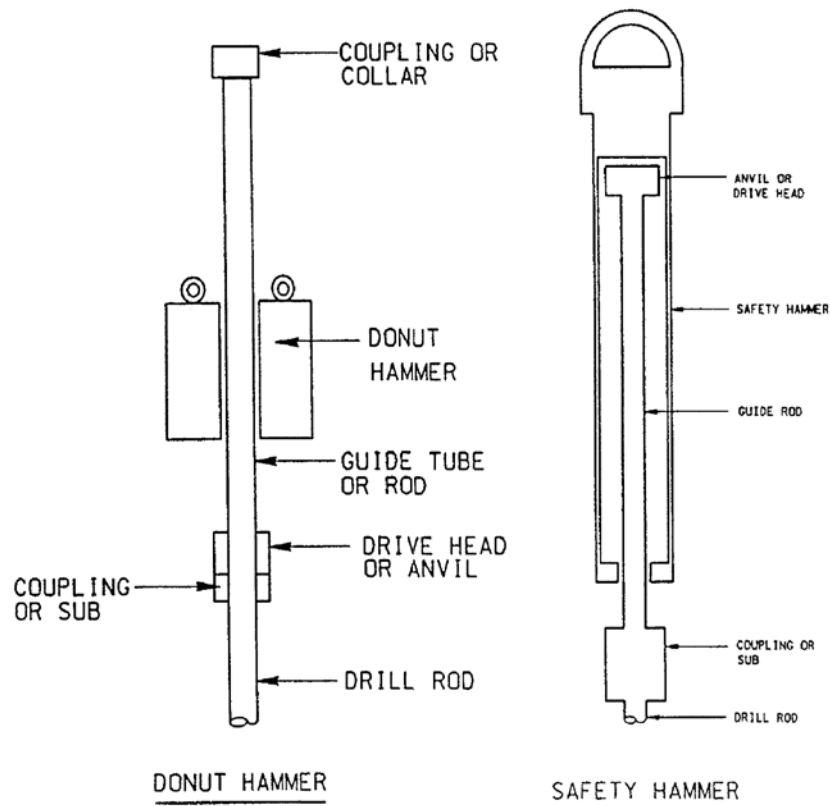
Schematic Drawing of the Donut Hammer and Safety Hammer
